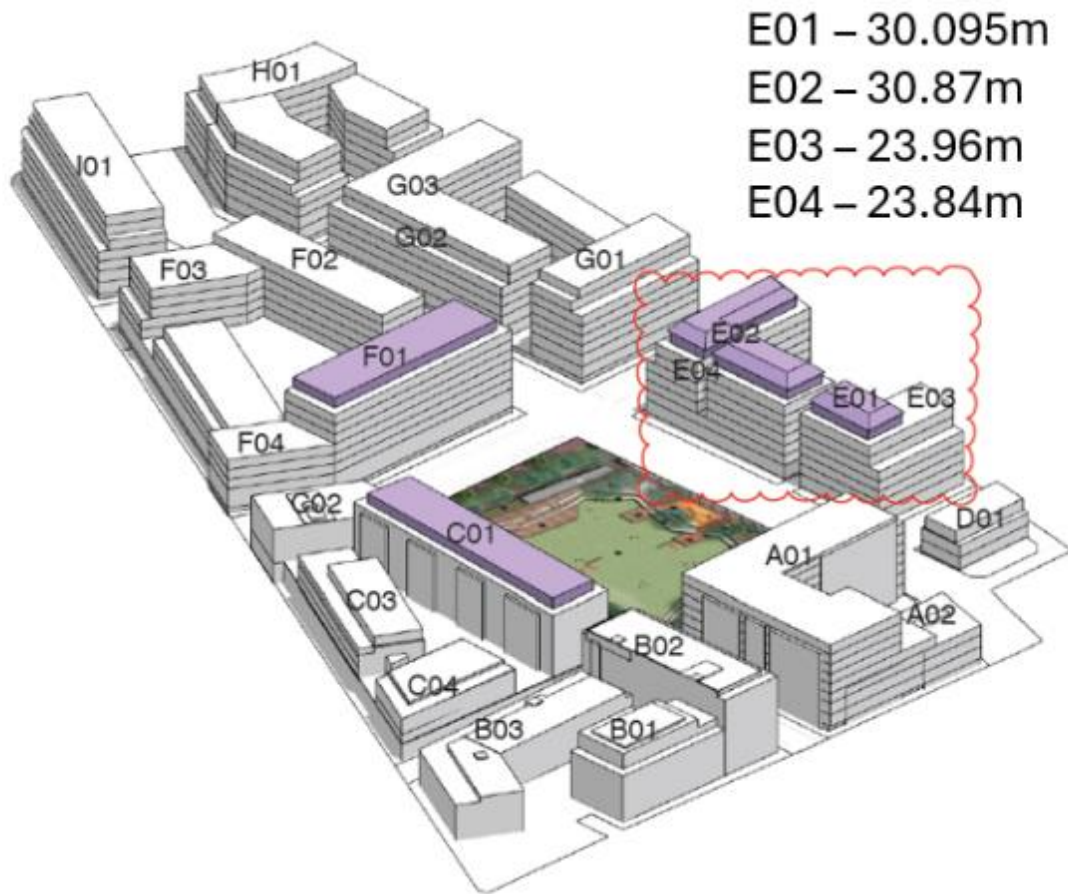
Proposed axonometric concept plan depicting building height (Block E - clouded)
